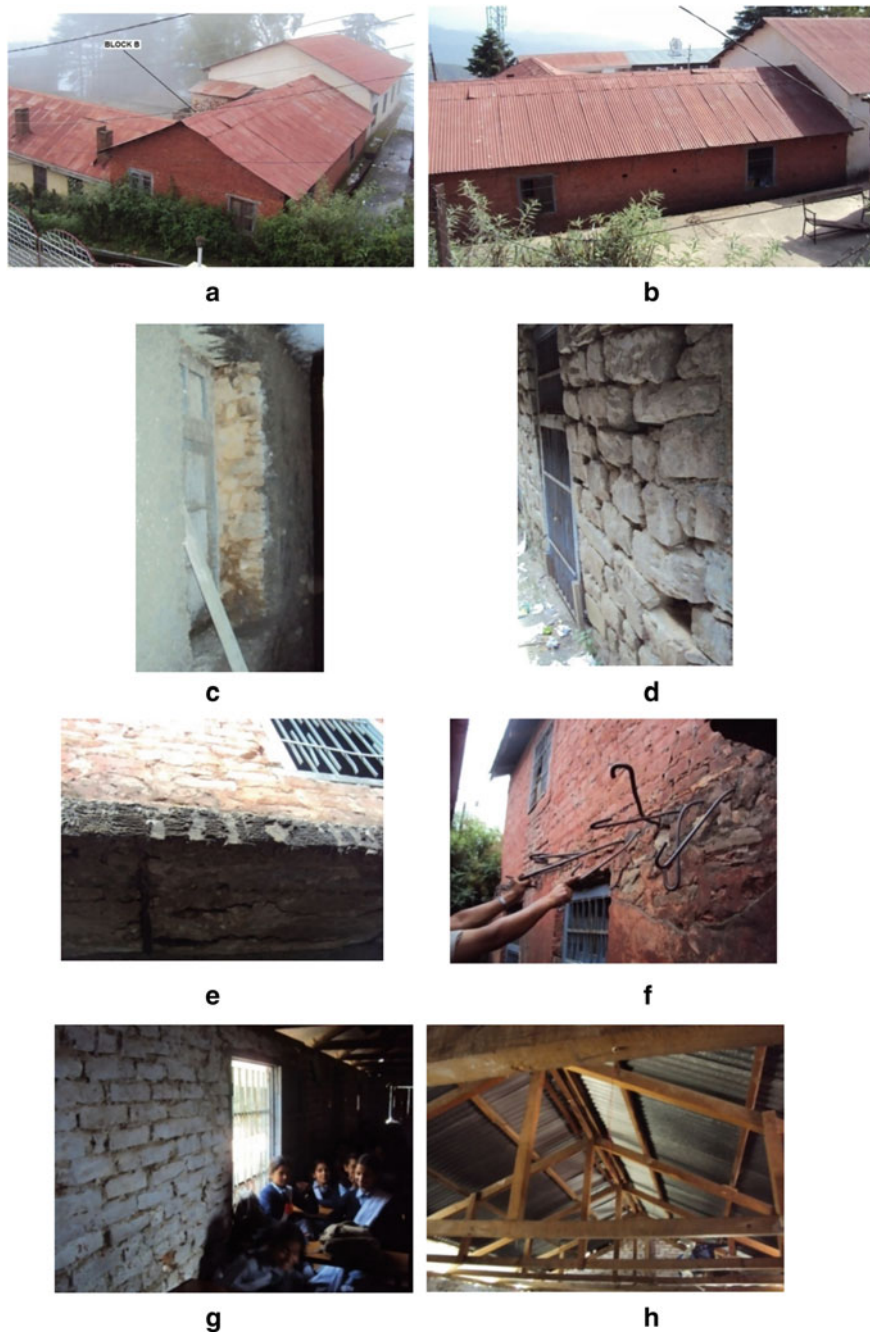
a Block B—an aerial view, b Back side view, c Wet random rubble masonry, d Wall thickness 0.5 m, e Slab thickness 0.1 m, f Slab reinforcement, g First floor wall thickness 0.115 m, h Roof truss
